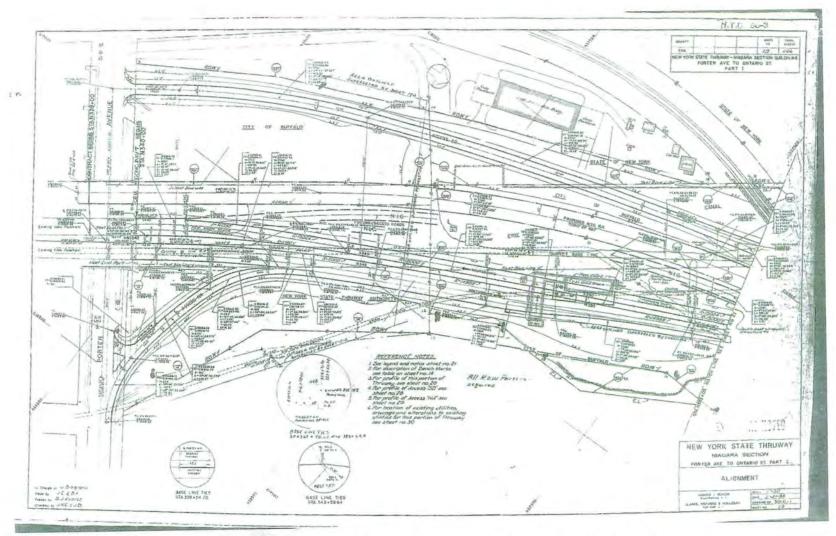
Alignment Sheet No. 19, New York State Thruway, Niagara Section, dated 3-21-55.
